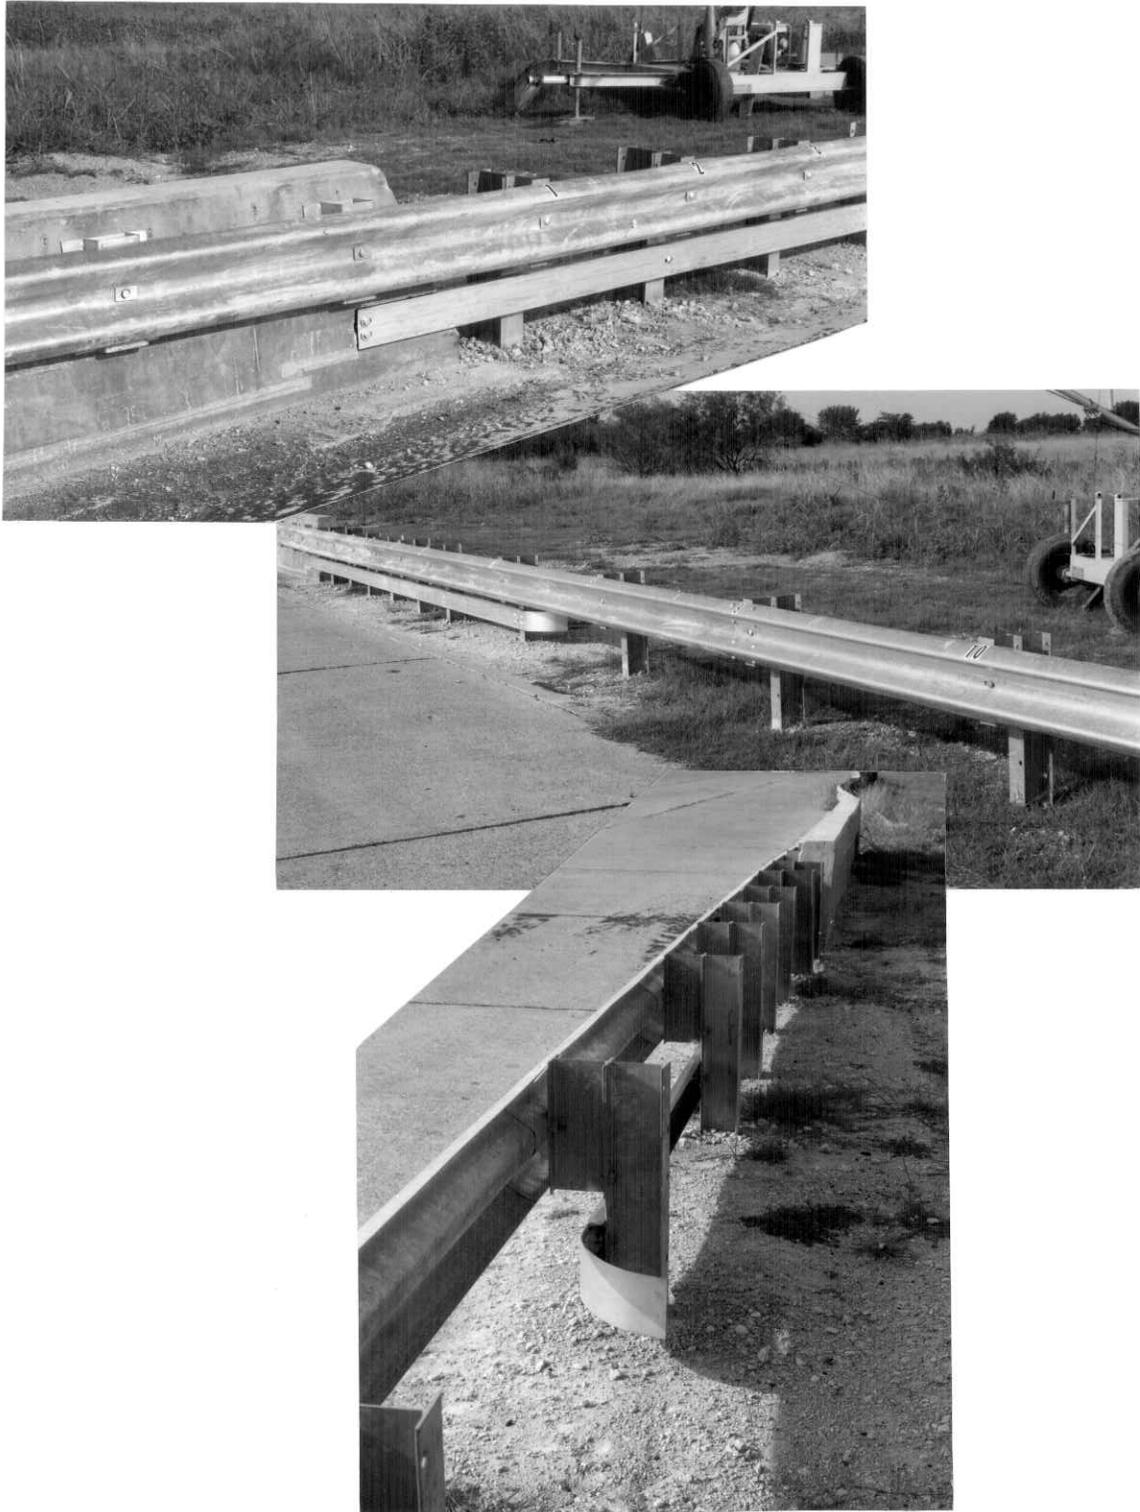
Arizona guardrail transition to concrete barrier before test 7155-2
